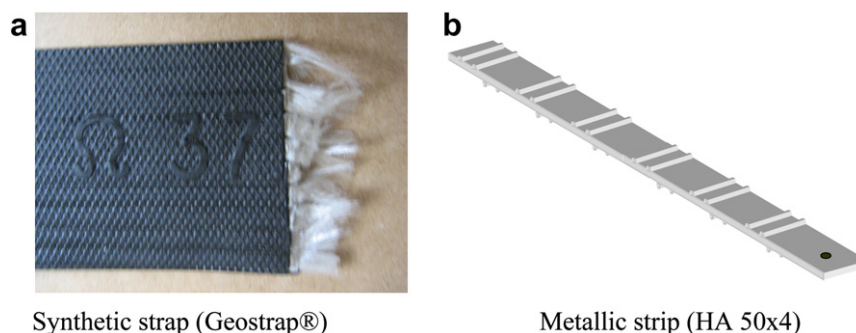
Reinforcement: a. Synthetic strap (Geostrap®) b. Metallic strip (HA 50x4).
